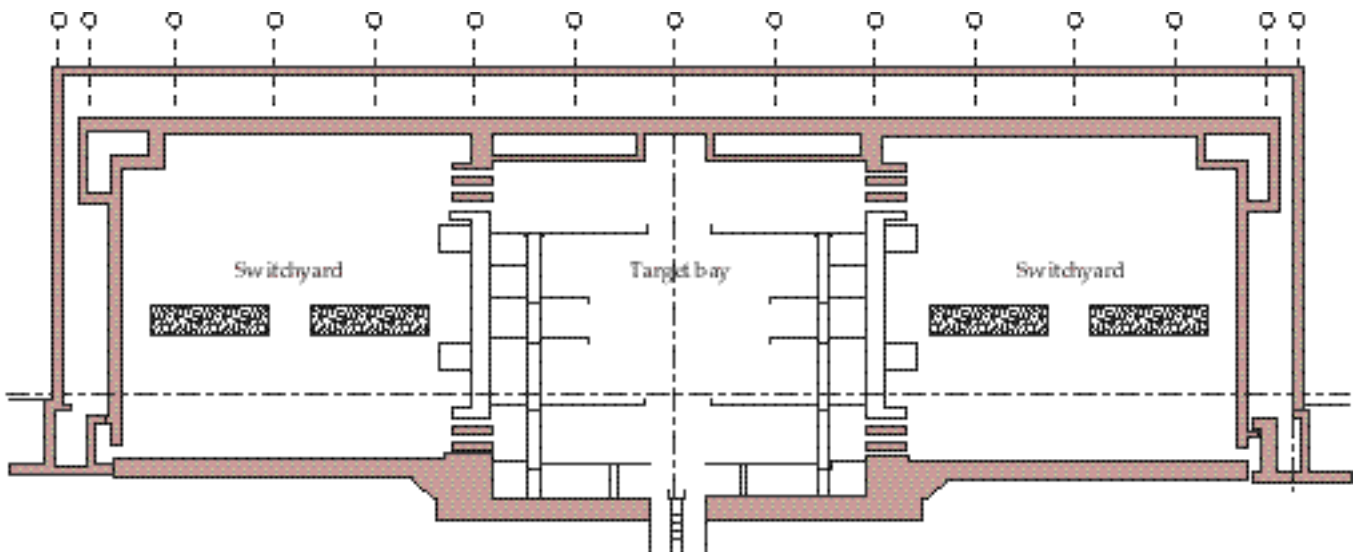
Shielding design. (40-00-1097-2231pb01)
